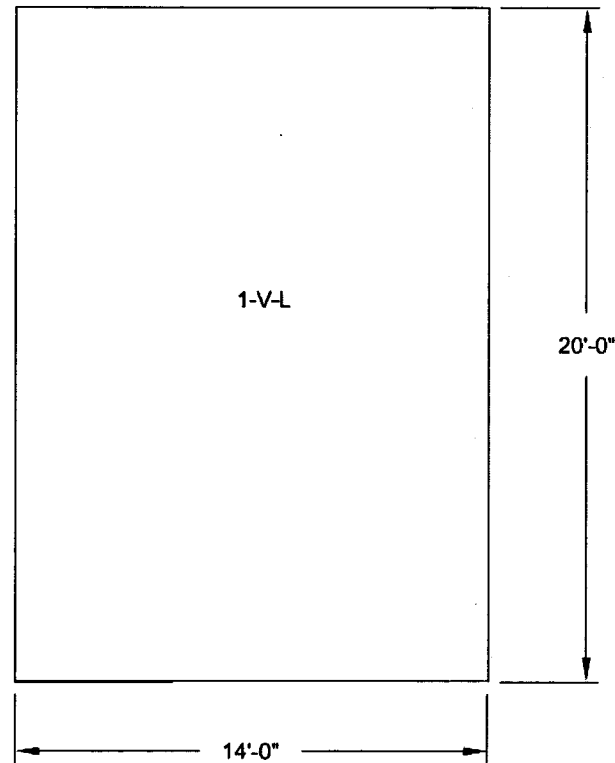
H.6-174 Wall 9 Looking From Outside
